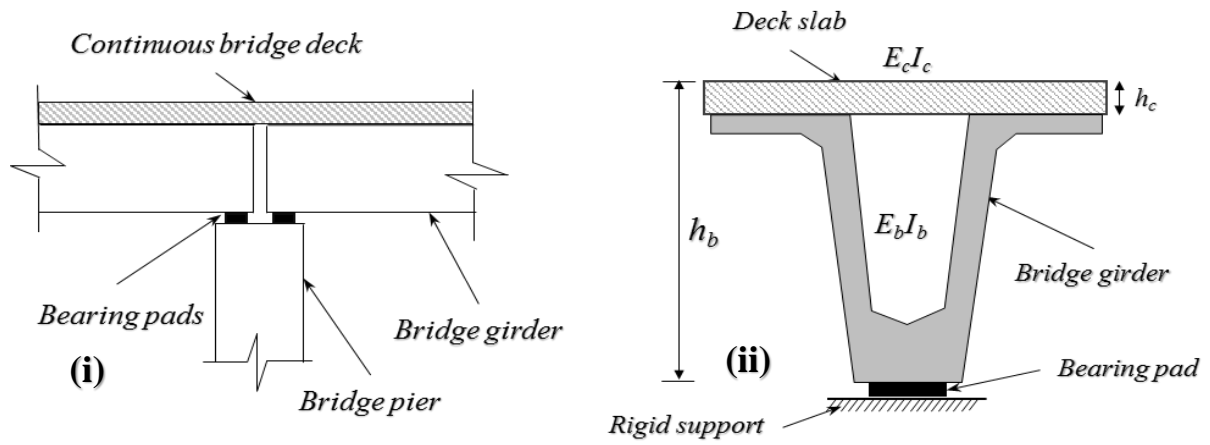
Support conditions of bridge girder, (i) elevation (ii) cross-section
